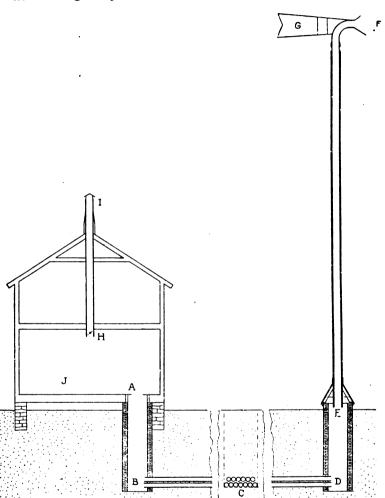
Section of cheese-curing room and horizontal multiple sub-earth duct. A, inlet to curing room; B, end of sub-earth duct in bricked entrance to factory; C, cross-section of the multiple ducts; D, E, bricked entrance under funnel at outer end of sub-earth duct; F, funnel with mouth 36 inches across; G, vane to hold funnel to the wind; H, ventilating flue with damper.
